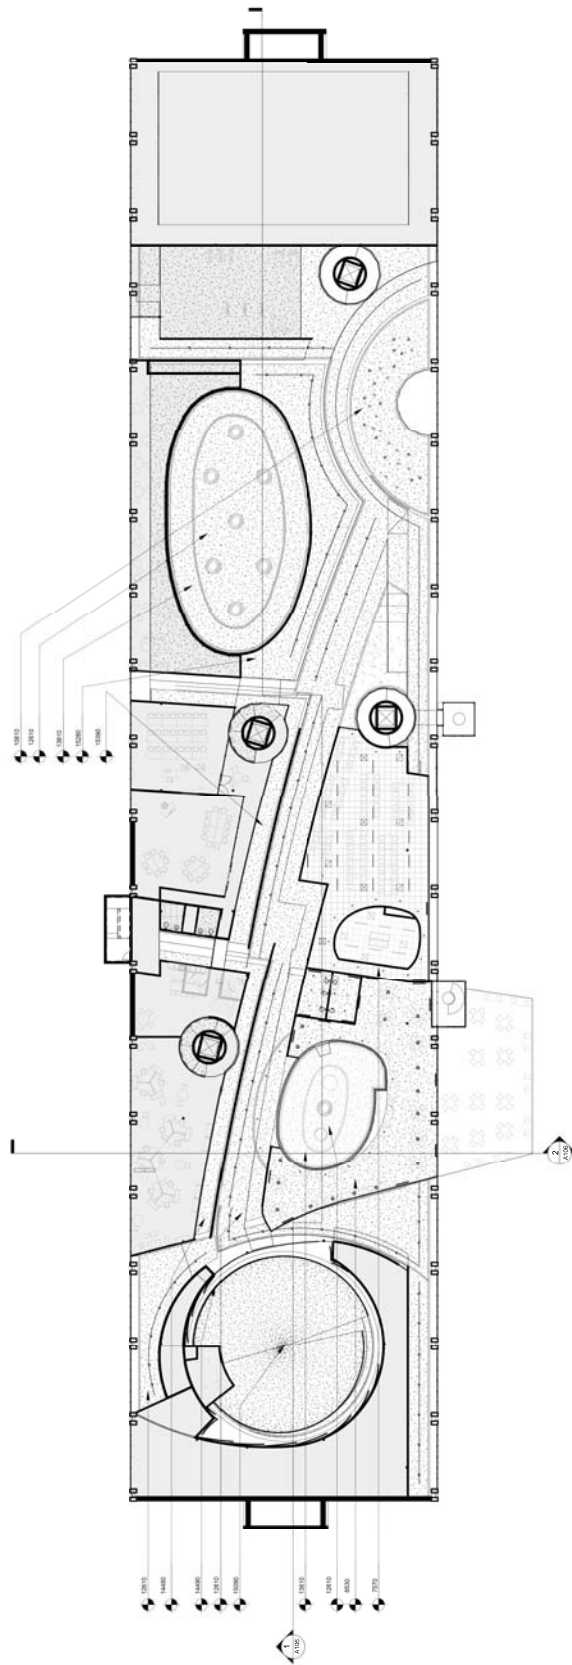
Drawing by author. (2015). Main level reflected ceiling plan.
